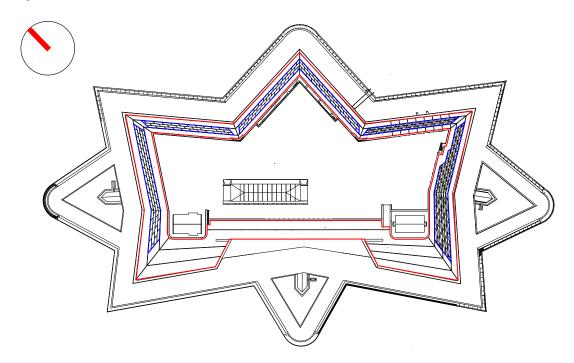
Plan diagram showing extent of sky roof, fenestration pattern and concrete envelope
